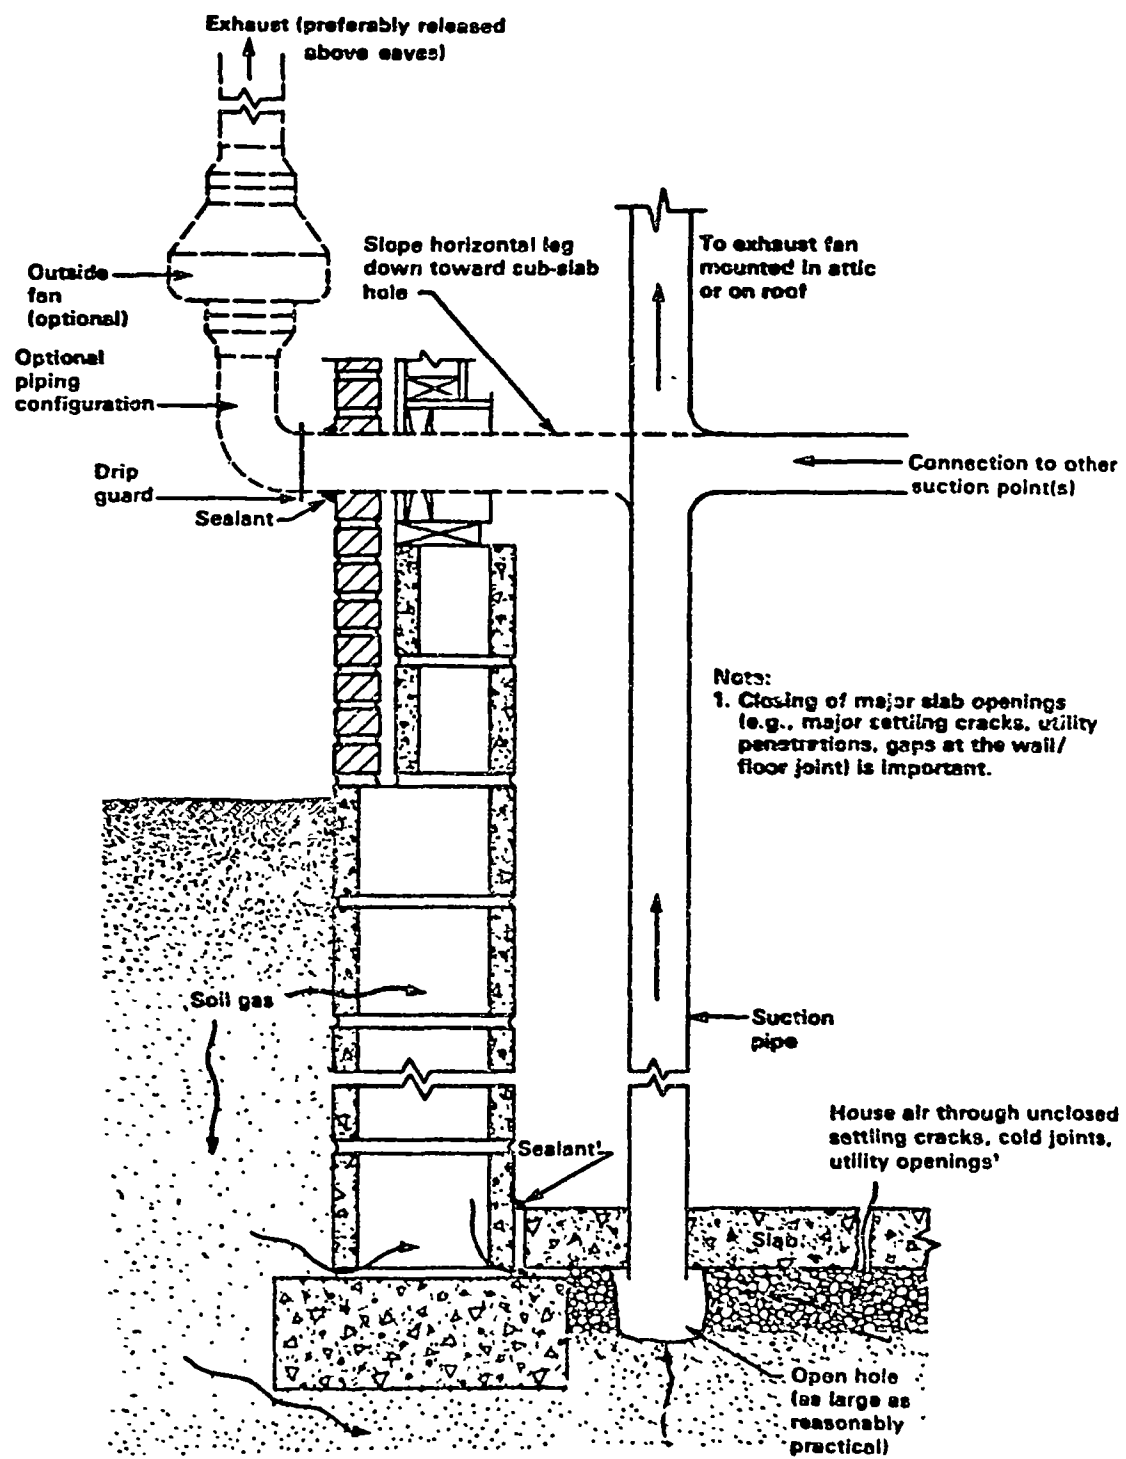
TYPICAL SUB-SLAB VENTILATION INSTALLATION
